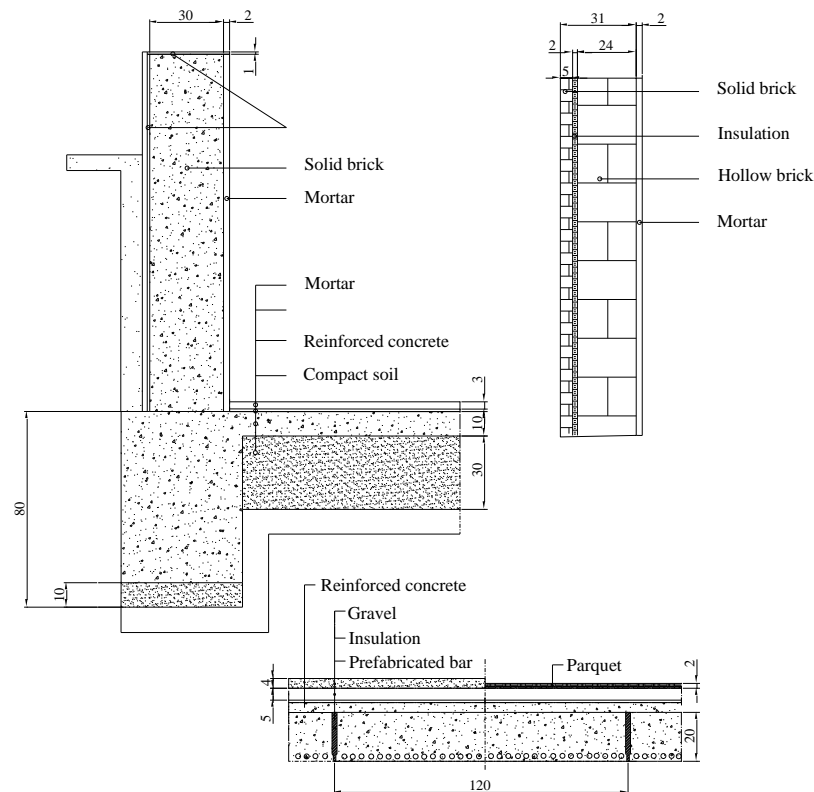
MSB 1981/97- Construction details of basement wall and floor, external wall, and ceiling/floor
